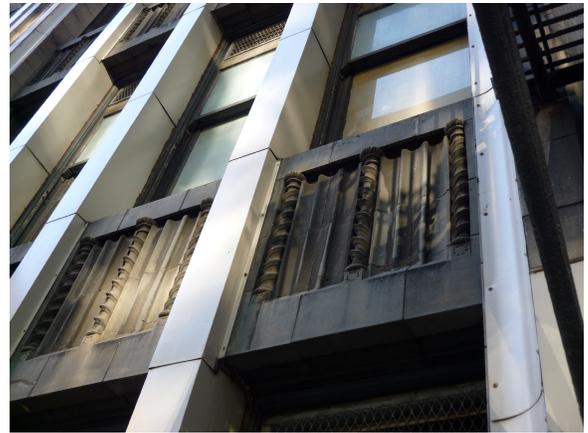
Typical terra cotta detail of the 4th through 15th floors, north façade.
